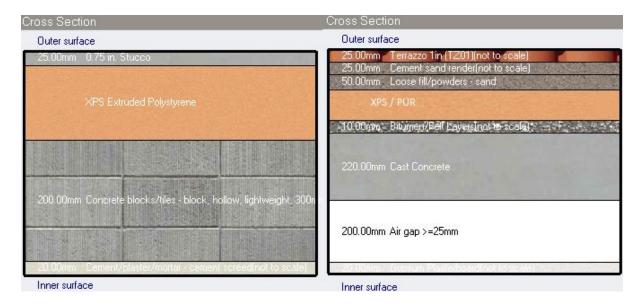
Cross section of EIFS wall layers (Left) and roof layers (Right)
